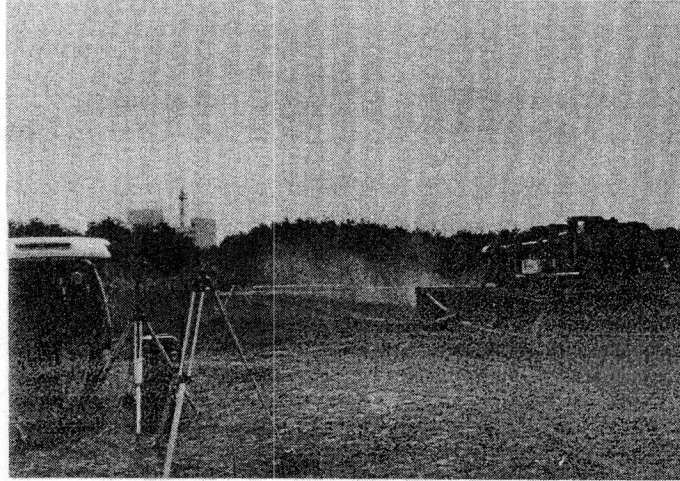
LEVELING WORK ASSIST SYSTEM
